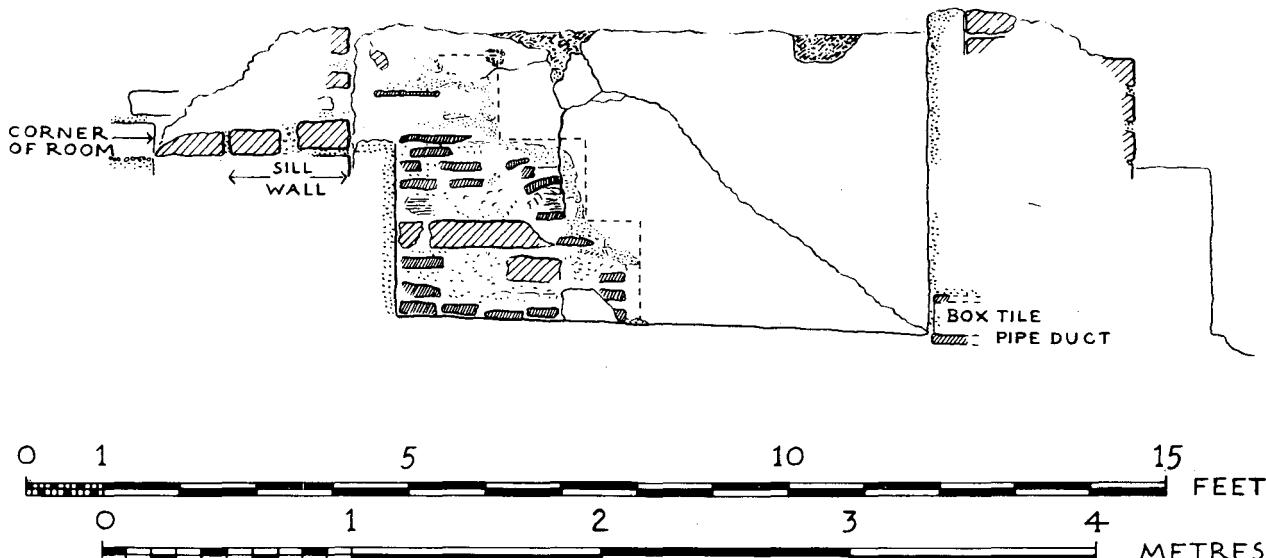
The Bath-building, Section of Cold Plunge bath. Scale, 1:30.
